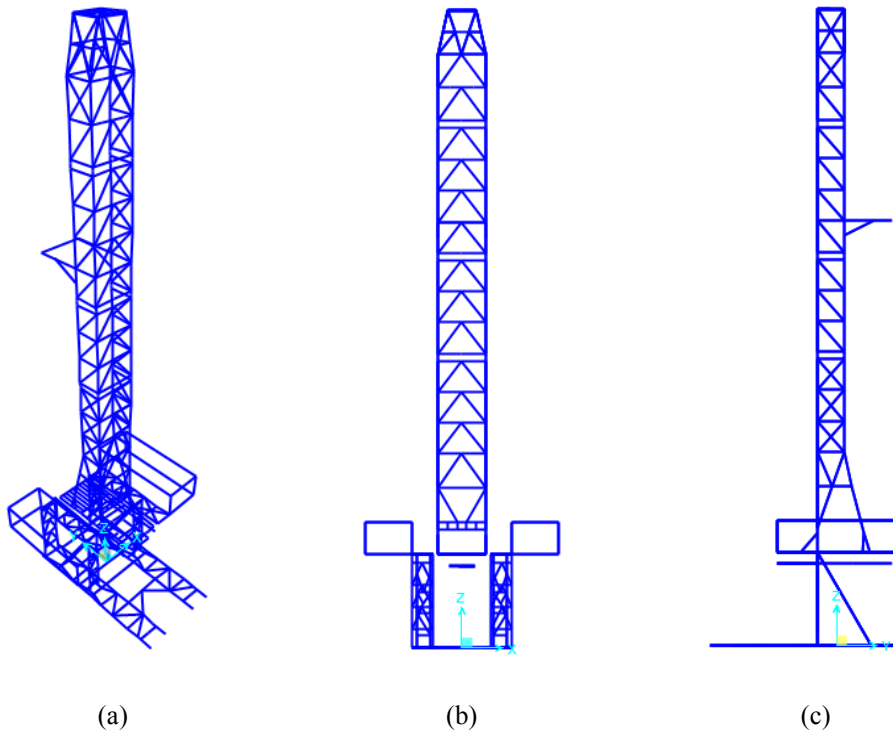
Layout of a Land Rig (a) 3-D View, (b) Front View, (c) Side View
